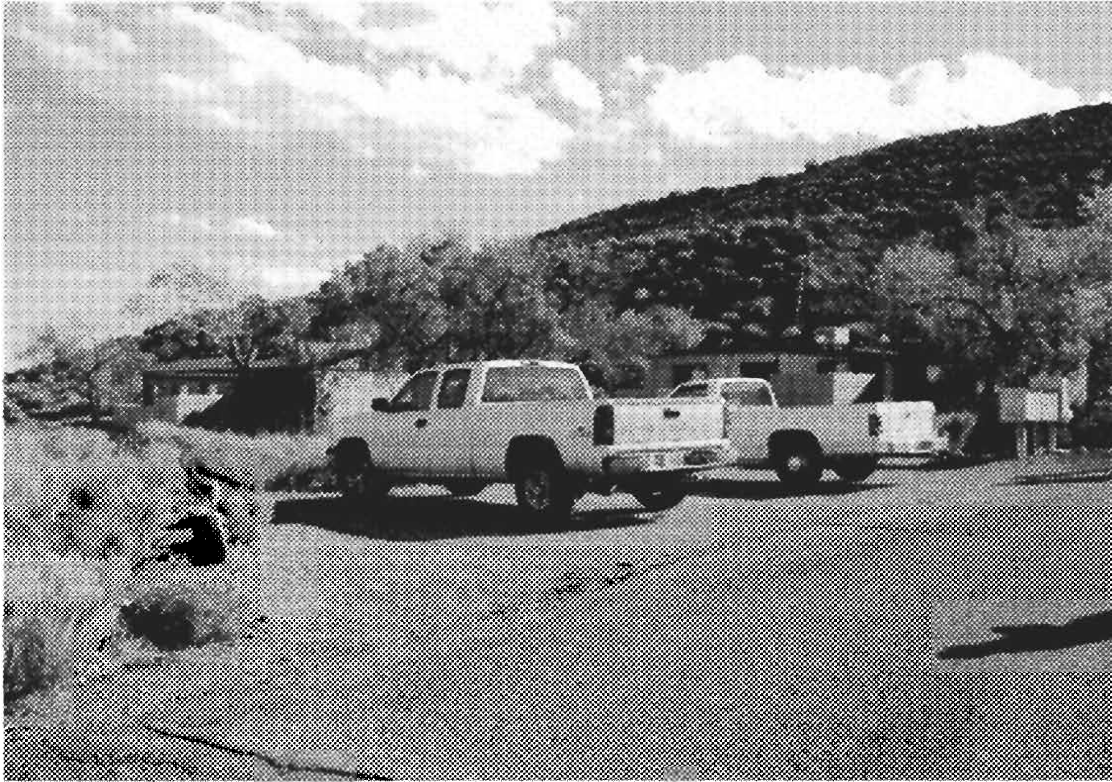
OVERFLOW PARKING AREA TO BE PAVED
